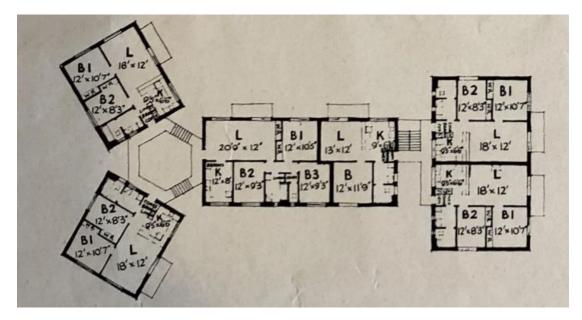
Floor plan layout of the six flats in each cluster of the first stage of Hotham Gardens Source: *Cross-Section*, University of Melbourne Department of Architecture, No. 100, 1 February 1961, p. 3.
